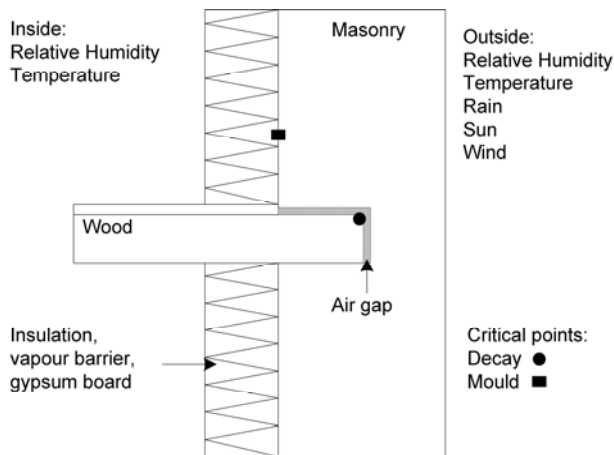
Solid masonry wall with inside insulation and embedded wooden floor beams.
